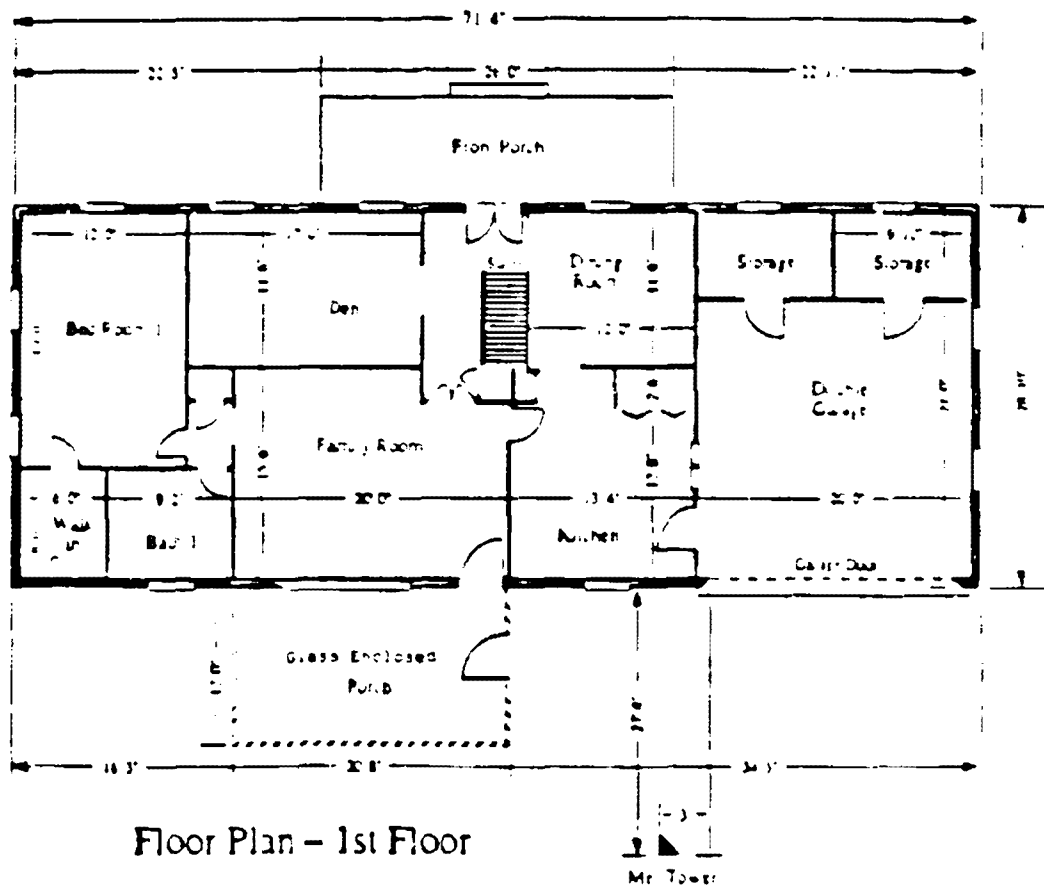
Residence floor plan. A second floor bedroom (not shown) was located directly above the garage.
